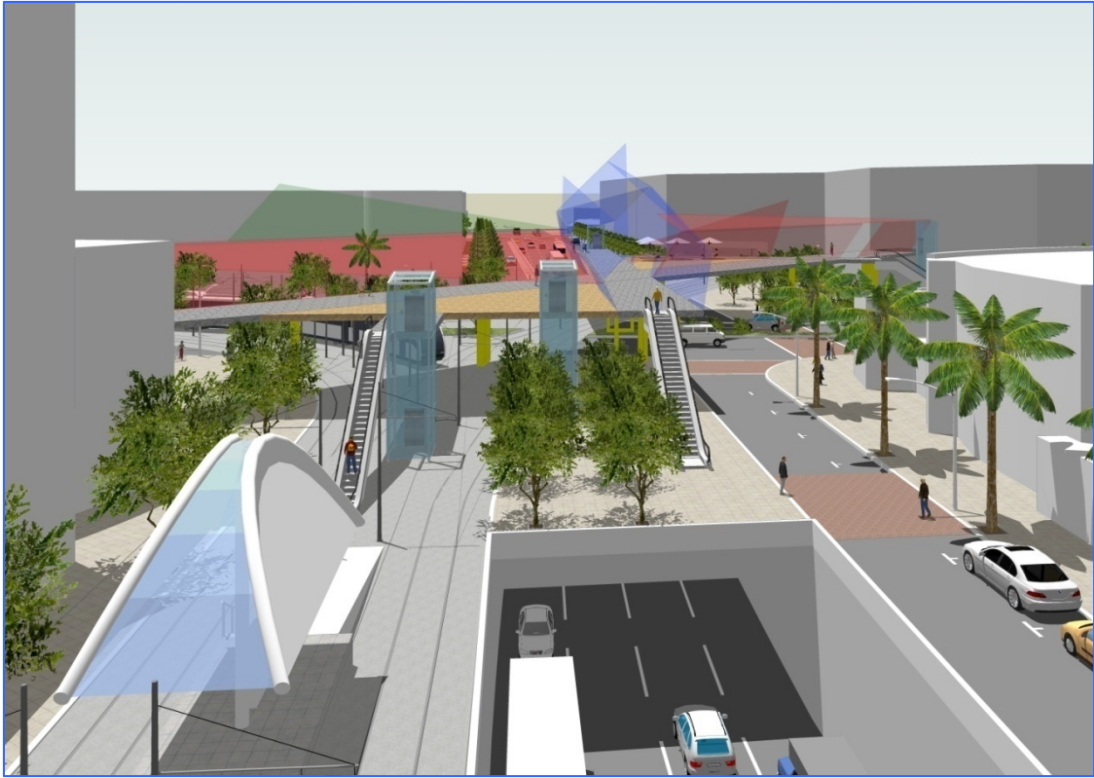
Underground Emphasis LRT Alternative – Alameda St. Underpass Looking South
